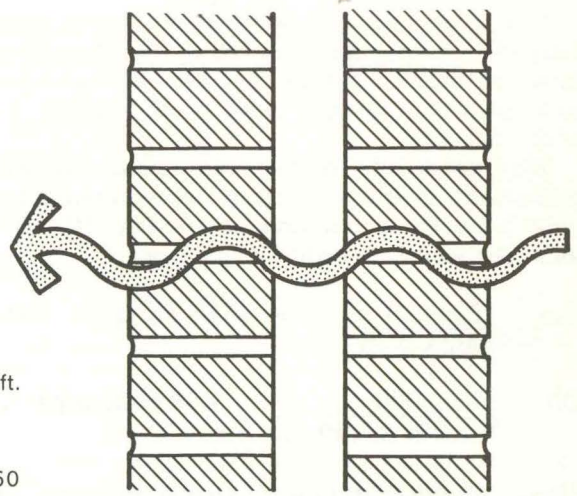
Masonry building with 2 wythes of 4-inch brick plus 2-inch air space.
